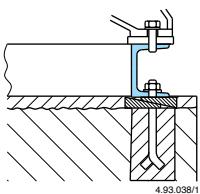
Foundation for unit mounted on welded, steel-section baseplate.
